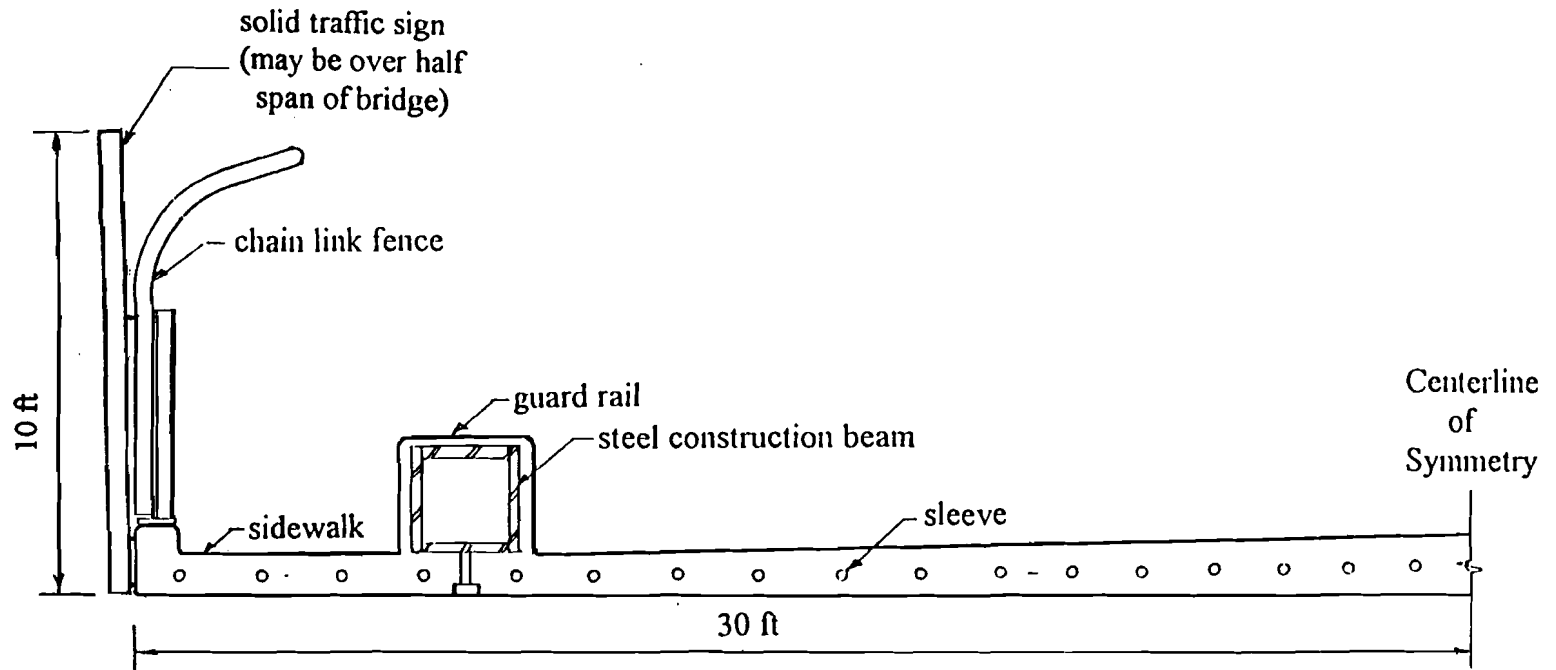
Cross-Section of the Deck of a Typical Tied Arch Bridge
